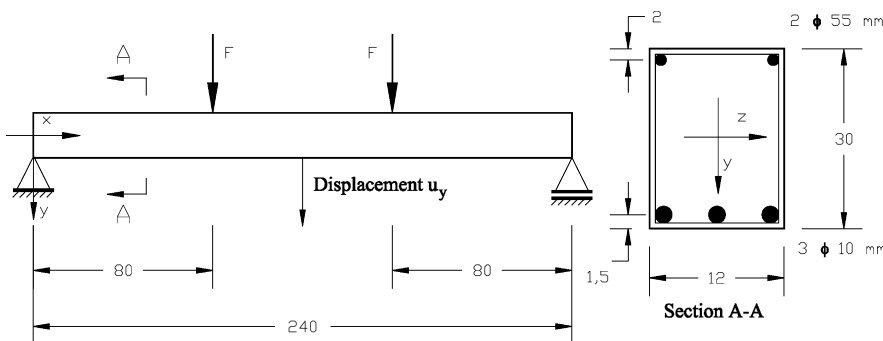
Reinforced concrete beam—geometry and reinforcement distribution—dimensions in cm
